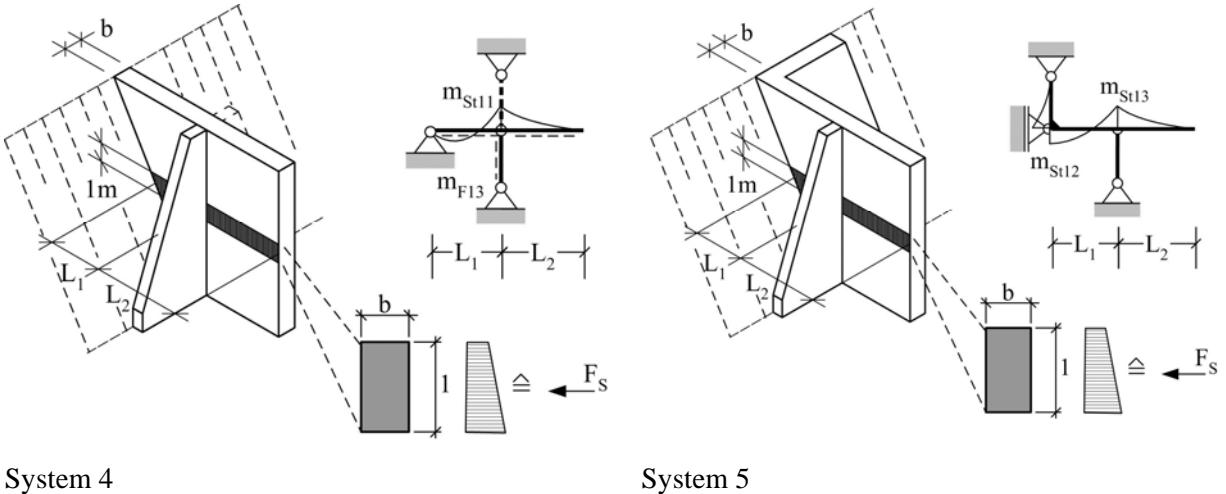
Slit barrier – elastic foundation and restrained foundation and slab systems
